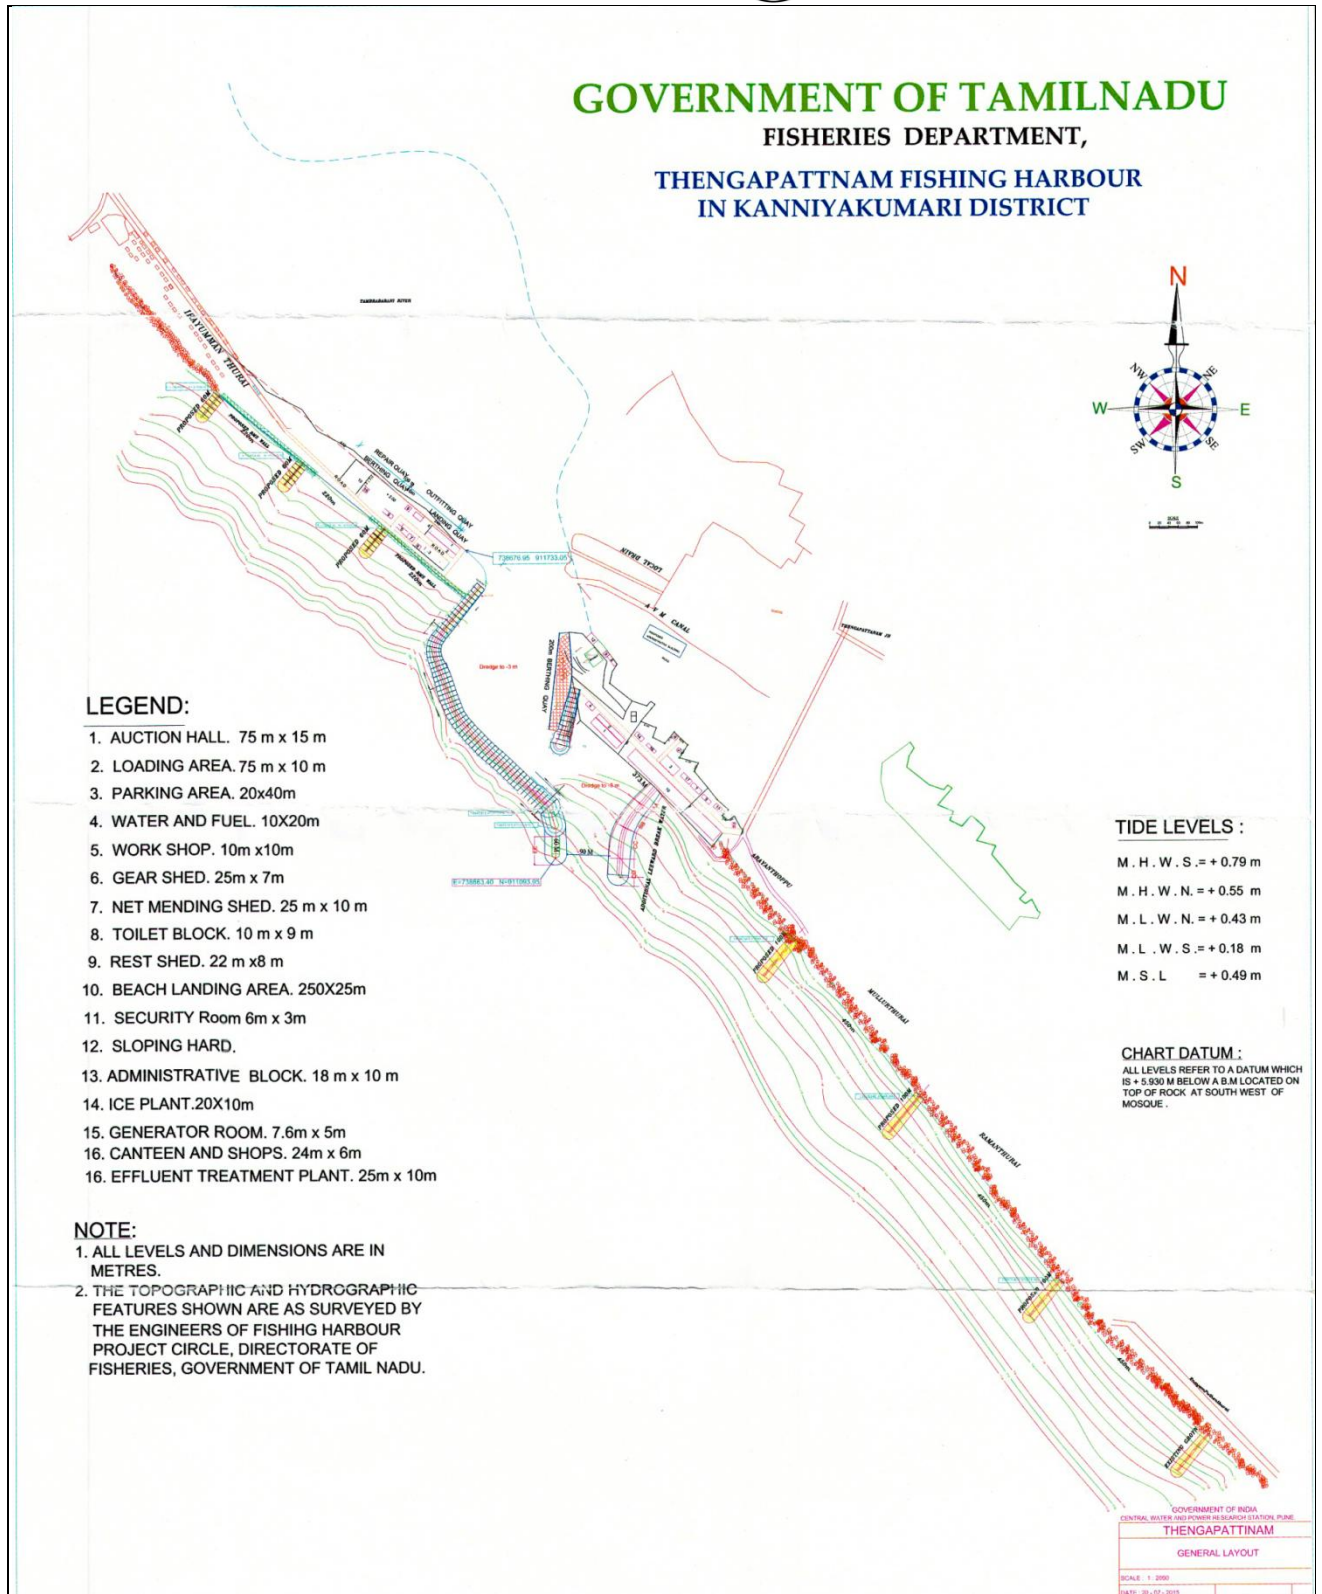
Layout of Proposed Fishing Harbour–Thengapattnam
